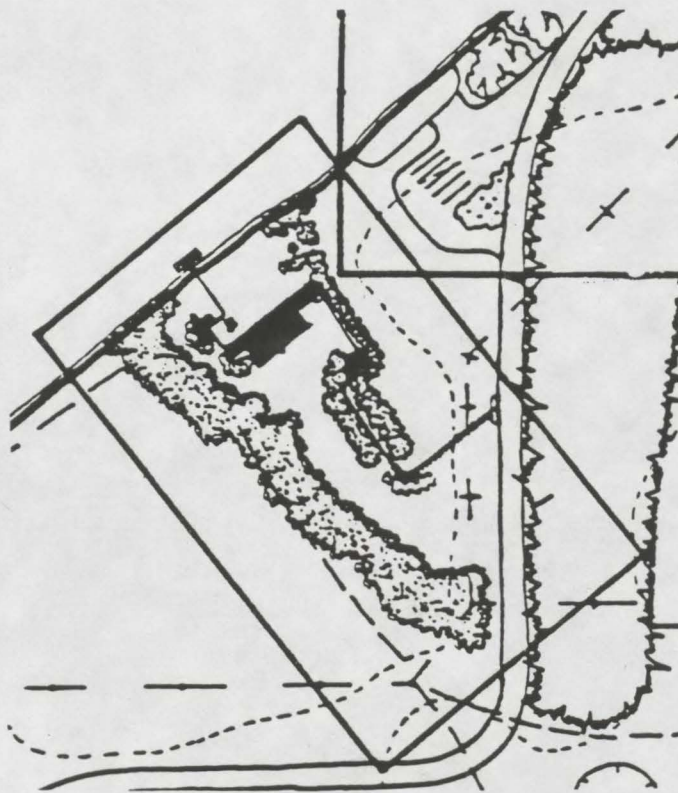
Arrowhead Point Park Dance Pavilion Plan.
